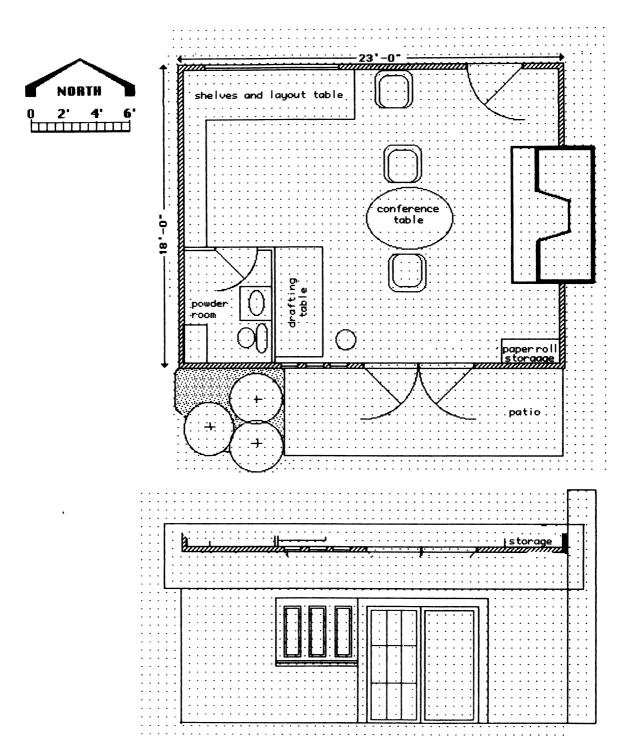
Windows and doors added to the elevation drawing are in line with the floor plan's window and doors.
